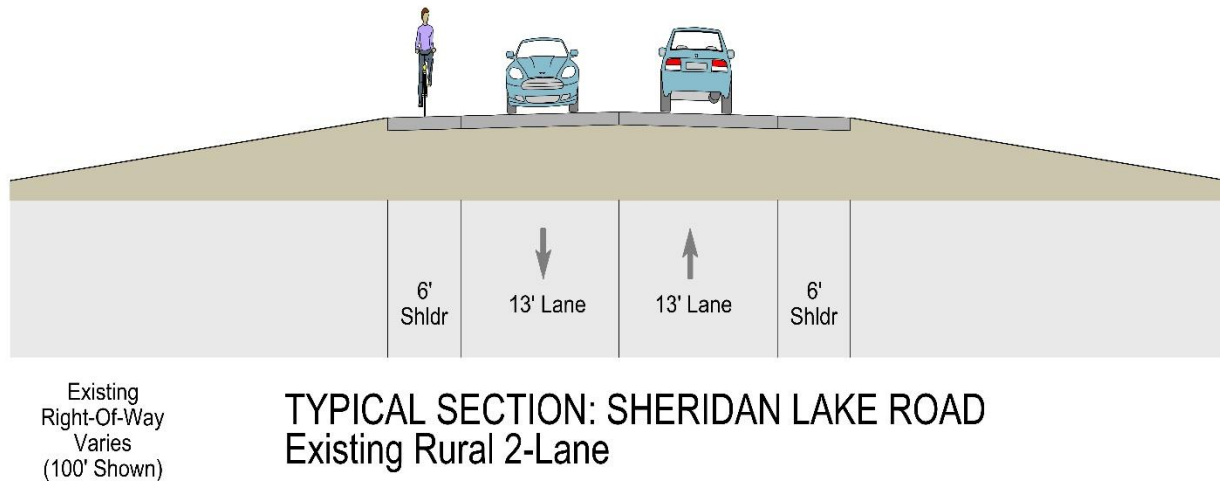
B. EXISTING RURAL ROADWAY CROSS-SECTIONS (TYPICAL)
